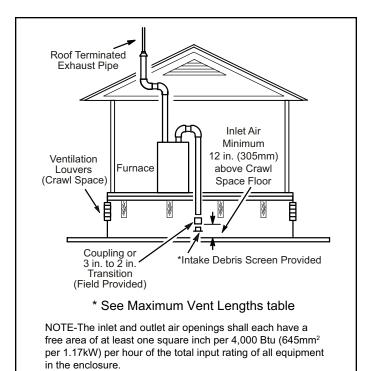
Equipment in Confined Space (Inlet Air from Ventilated Crawl Space and Outlet Air to Outside)
